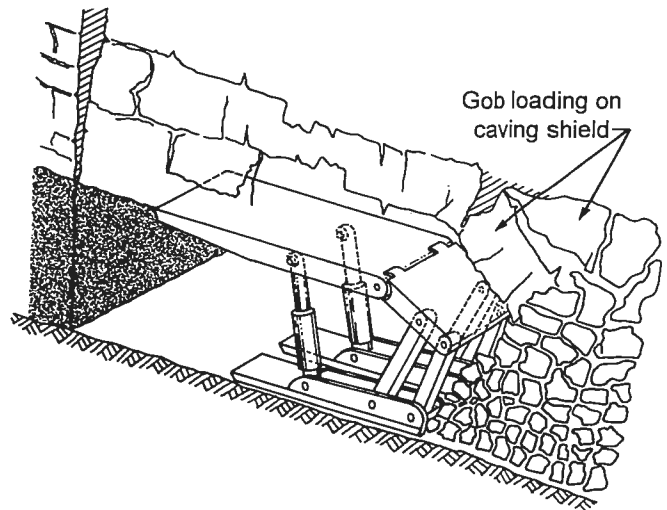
Horizontal loading toward coal face induced by gob loading on caving shield.
